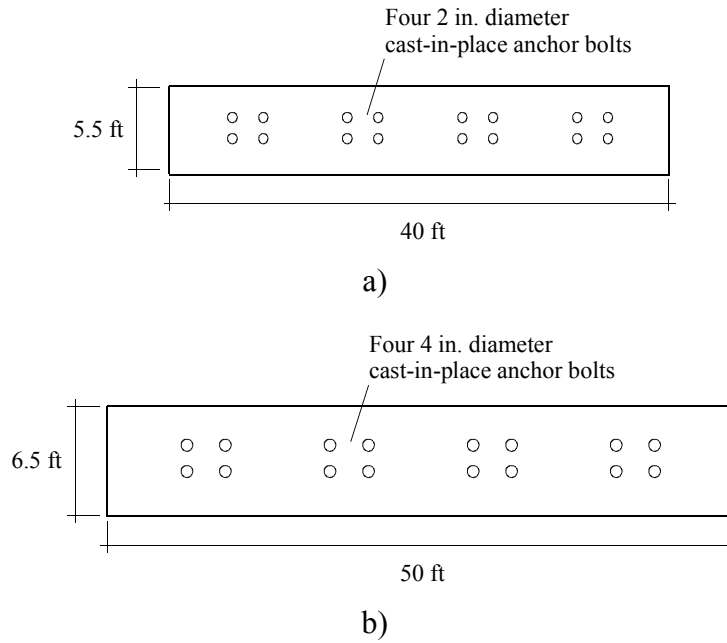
Original versus strengthened substructure-superstructure interface for Gandy Bridge Pier 75W case. a) Plan view of original pier cap beam; b) Plan view of strengthened pier cap beam
